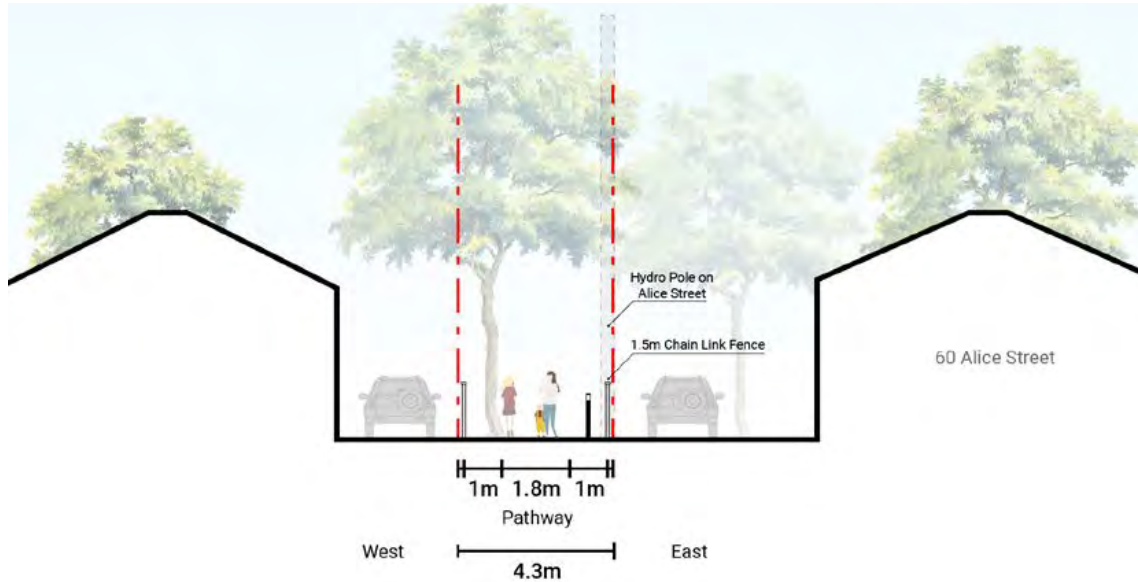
Alice Street Pathway Cross-Section 1 Looking North
